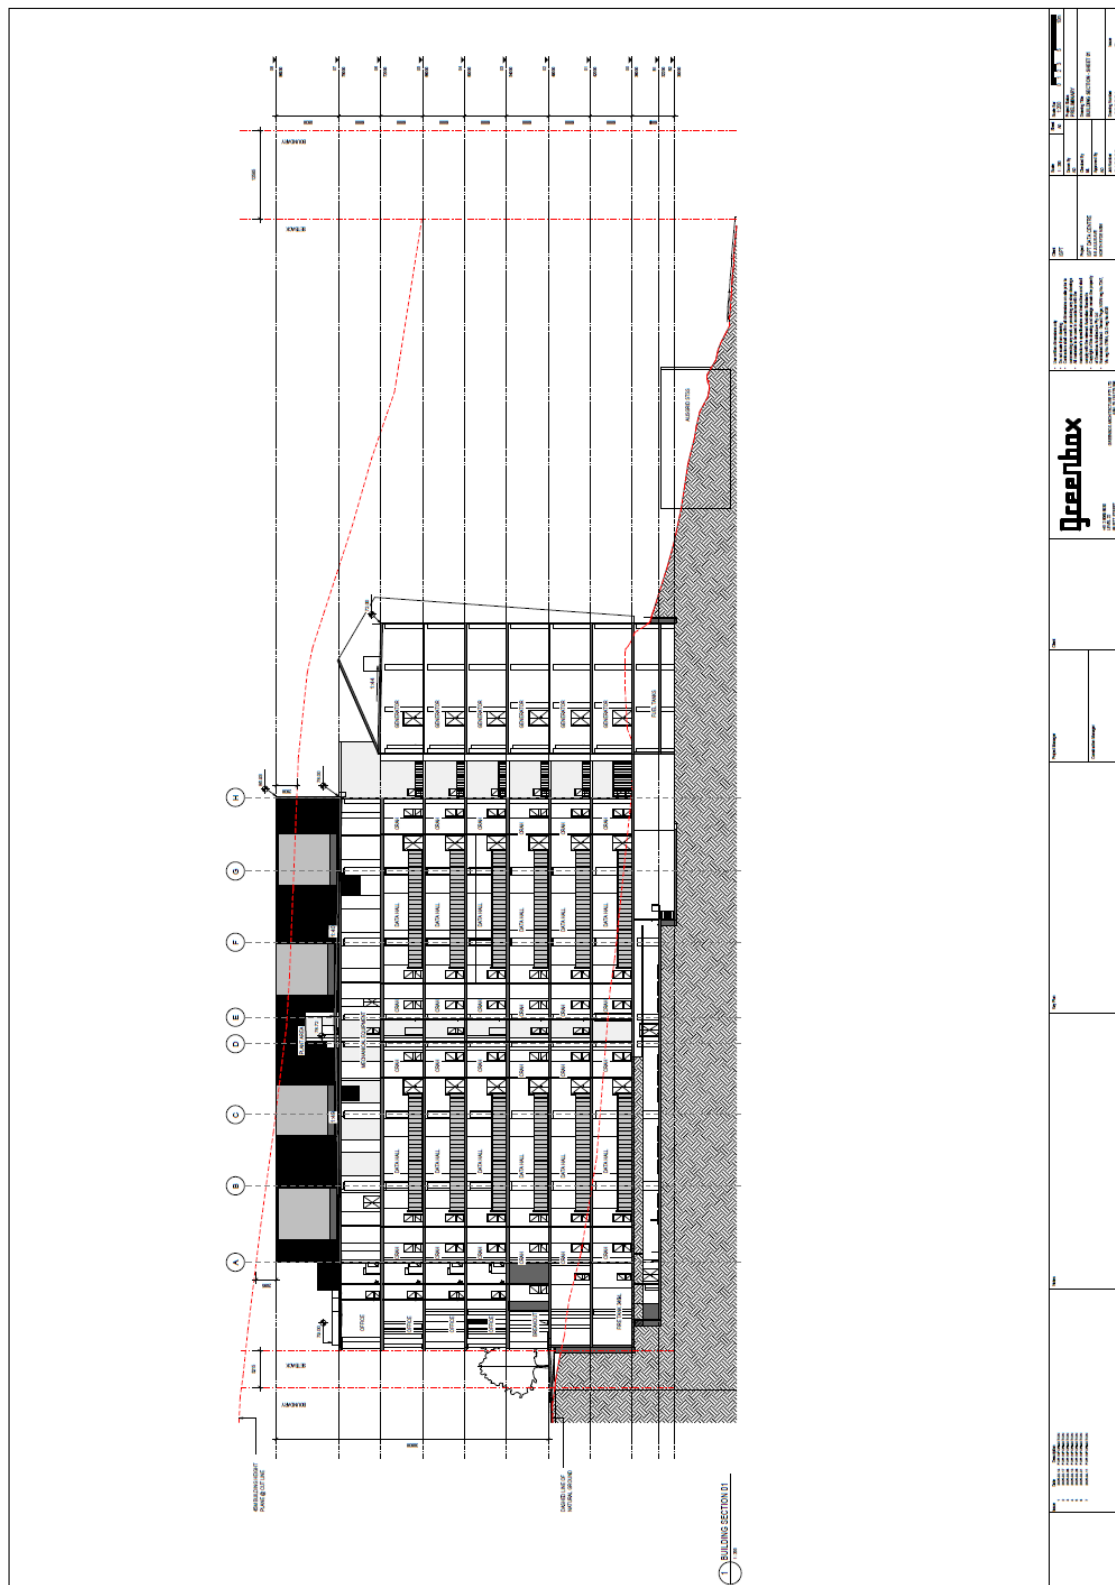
Northwest-southeast section of the proposed works. (Source: Greenbox Architecture, 2025)
